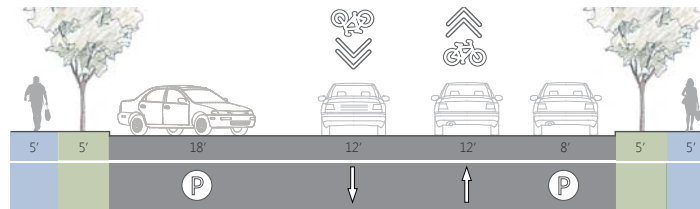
Proposed Bicycle Boulevard on Landis Avenue, East of Central Avenue
